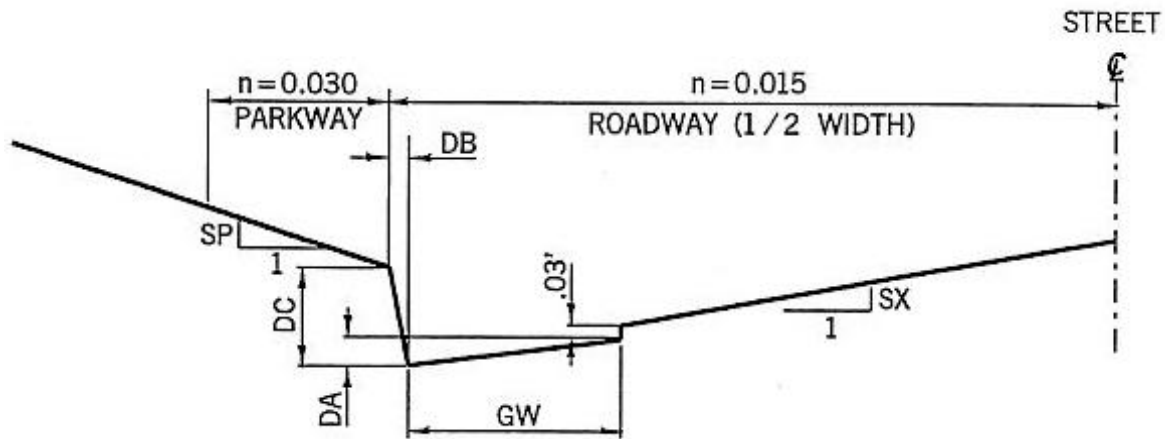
Standard A2-6 and A2-8 Curb and Gutter
